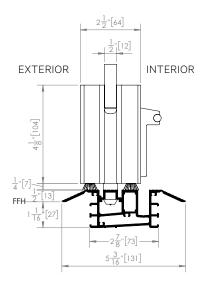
Bottom Profile - Sliding Panel with Foot Activated Floor Bolt
